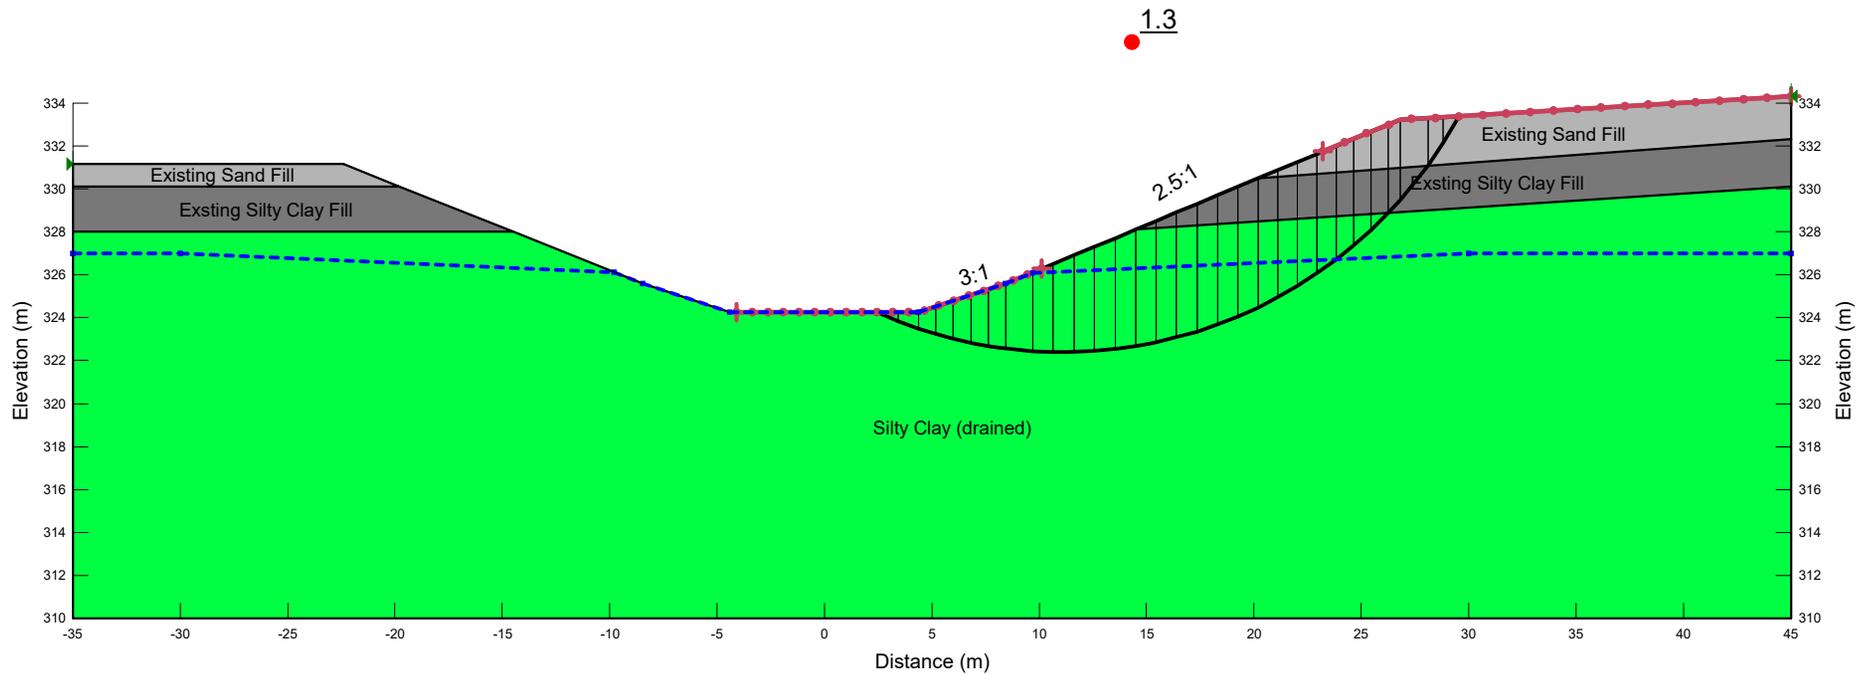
Lyon Creek Culvert Replacement - Temporary Excavation - Side Slopes 2.5:1 [Drained Analysis]
